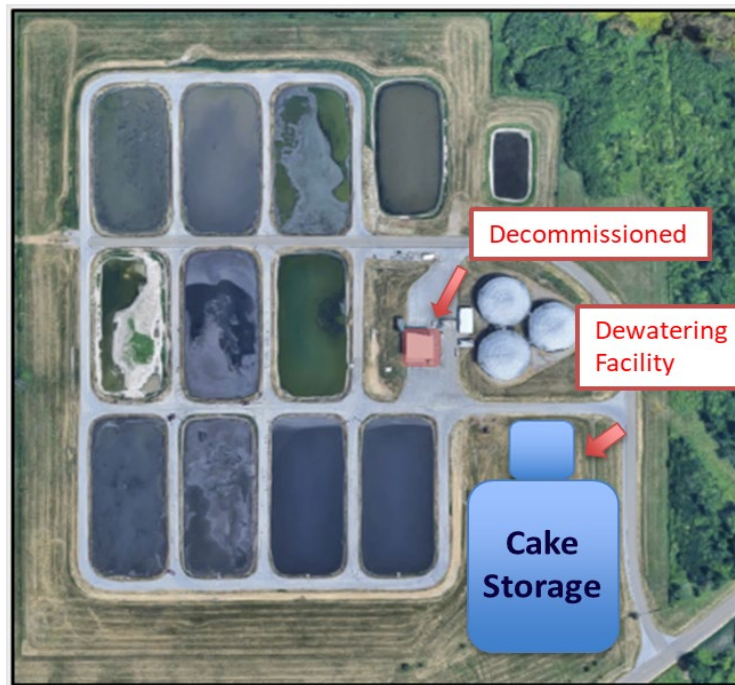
Strategy 2 – Garner Road Facility – Conceptual Site Plan
